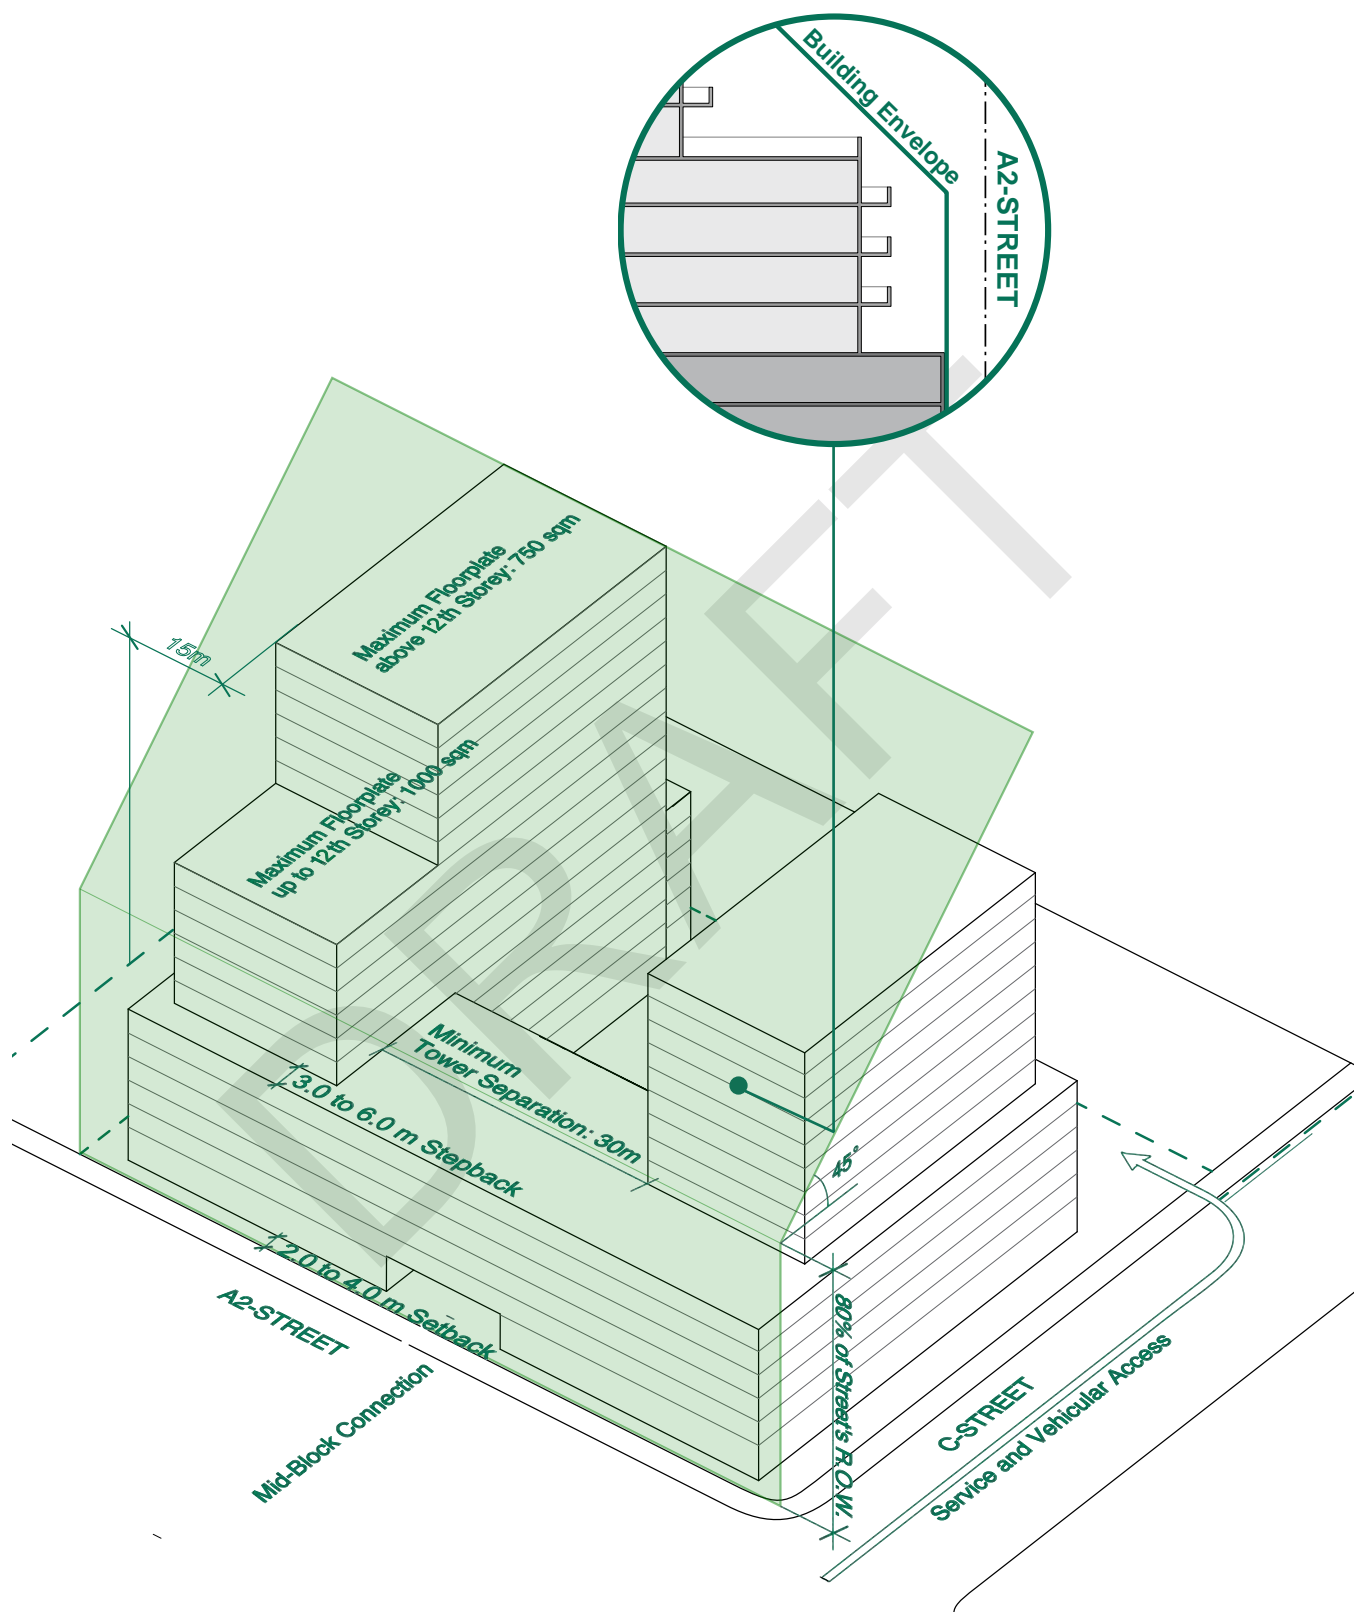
Frontage on an A2 Street with tower separations, setbacks, angular plane and floor plate size requirements indicated.
